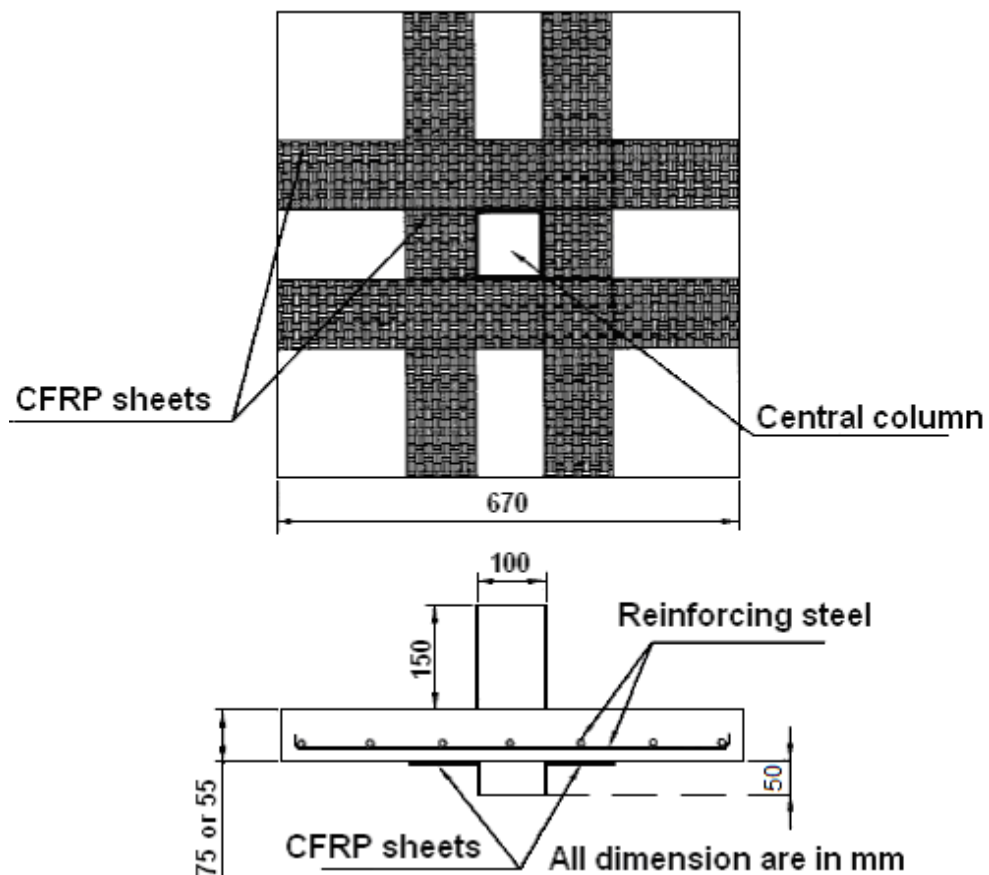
Dimension and details of reinforced specimen; Ref. [53].
